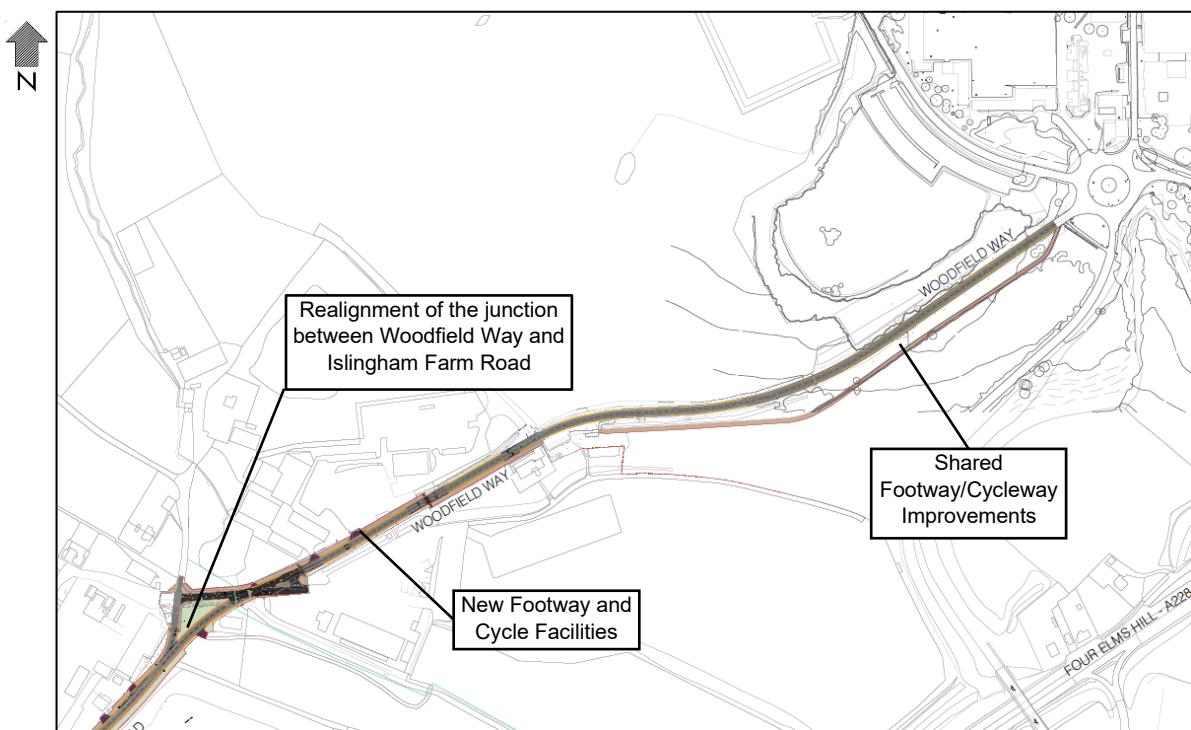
Option 1 - Proposed Widening of Islington Farm Road
